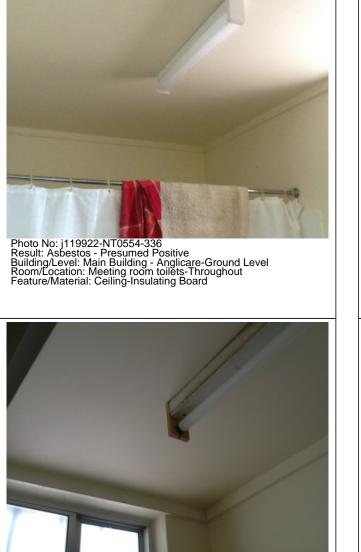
NT0554-328 Result: Asbestos - Presumed Positive Building/Level: Main Building - Anglicare-Ground Level Room/Location: Toilets-Throughout Feature/Material: Ceiling-Insulating Board
